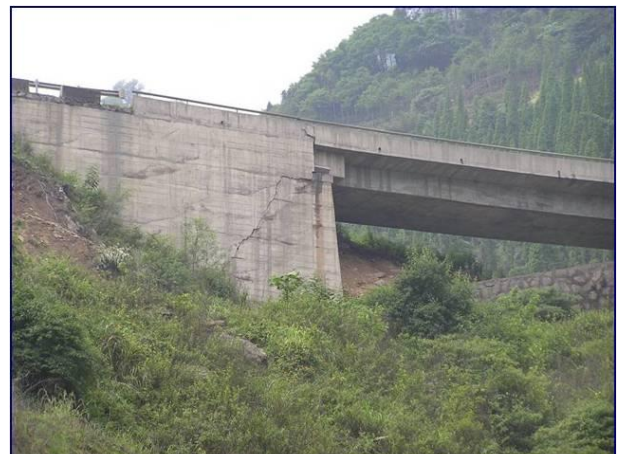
shows a section of gravity retaining wall that had collapsed. Such walls are commonly used to support highways and river banks in the earthquake affected area the team visited. Figure 112 shows a cracked concrete retaining wall.
